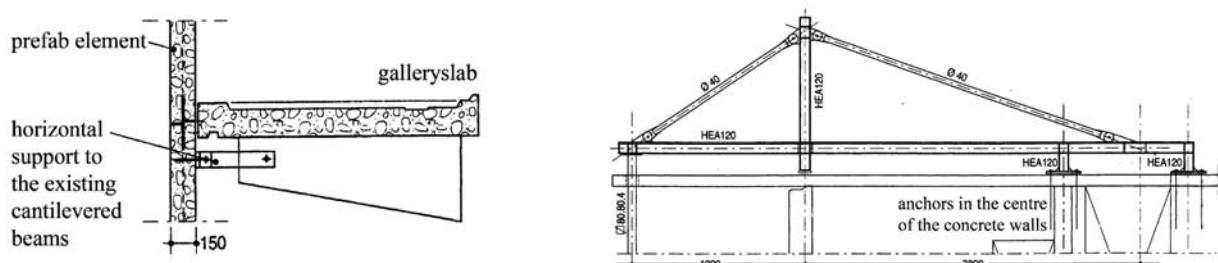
Connecting prefab façade elements to cantilevered beam; New concrete façade elements carried by tensile tubes to the roof structure
